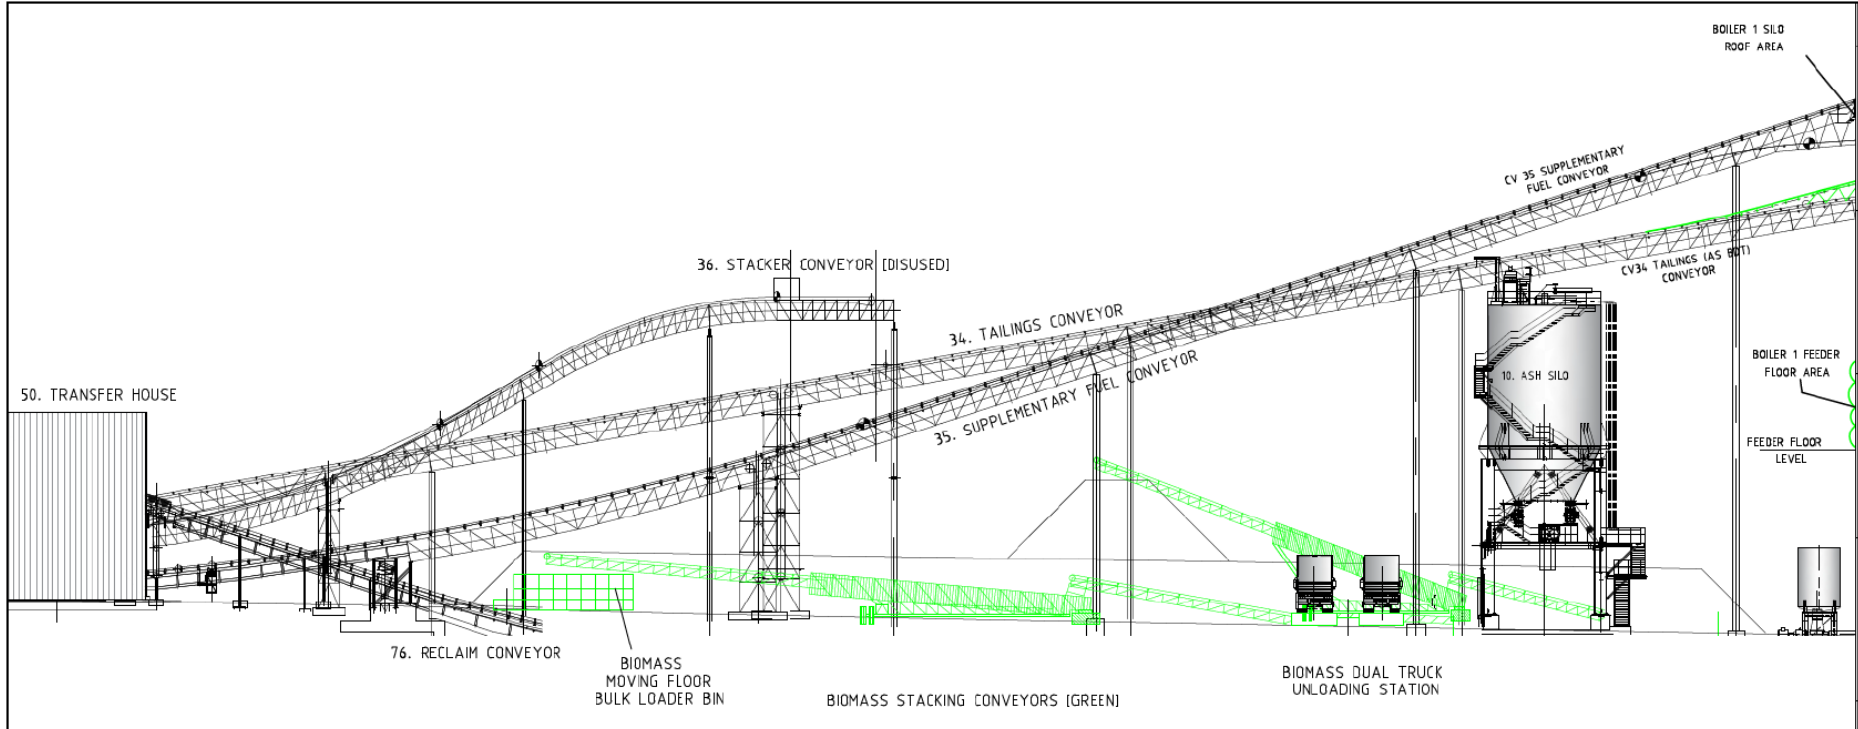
Biomass receival and handling showing additional plant/equipment in green. South elevation view. Refer to Appendix 3 for high resolution plan.
